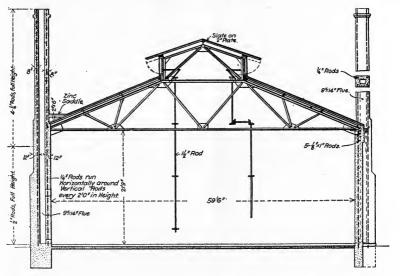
Forge shop. United Shoe Machinery Co., Beverly, Mass.
